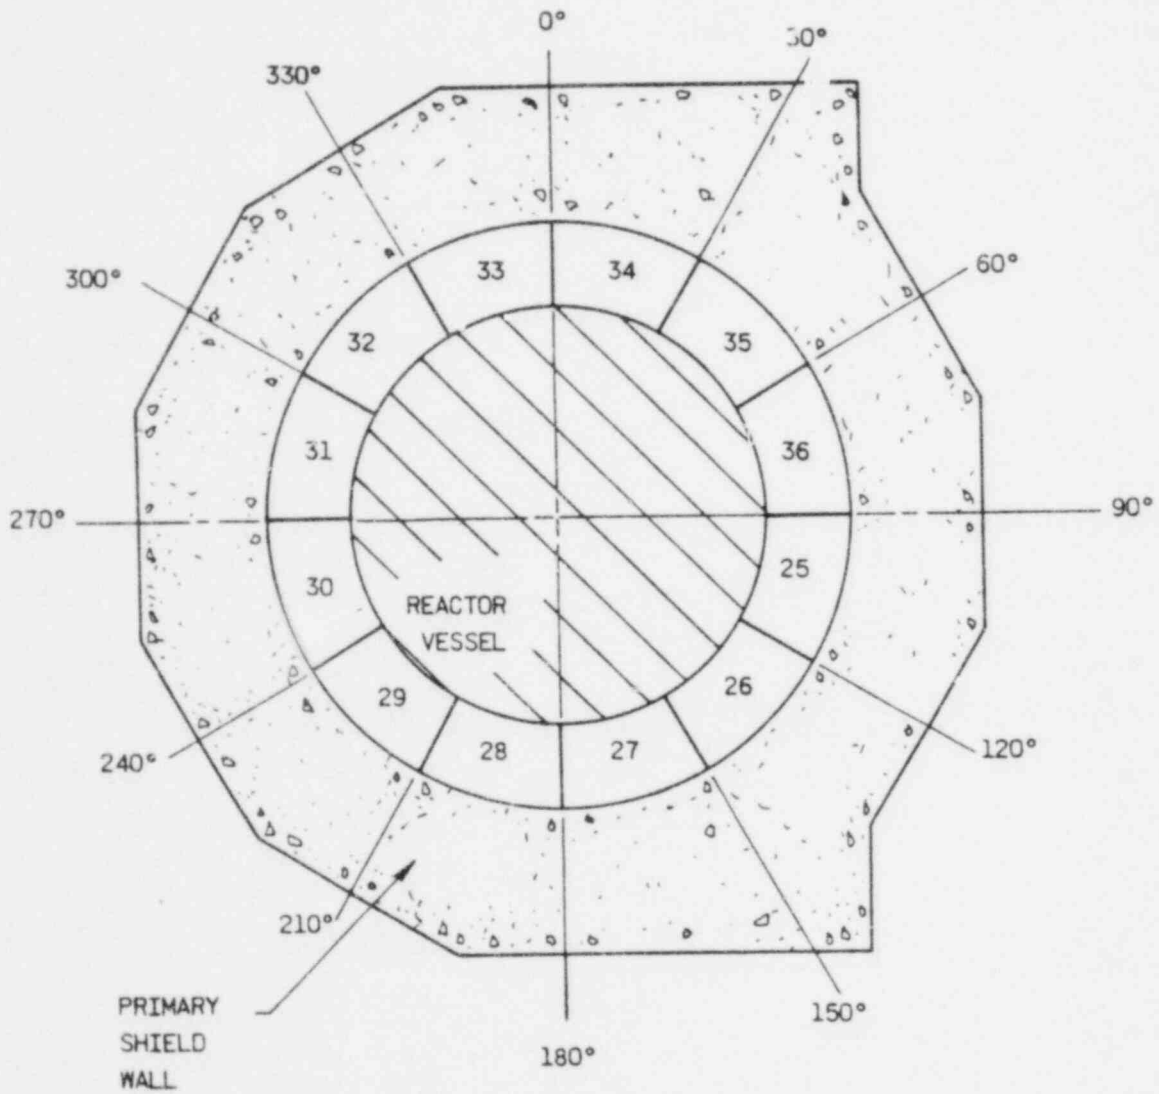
TMI-2 Reactor Cavity, Plan View of Level 4
